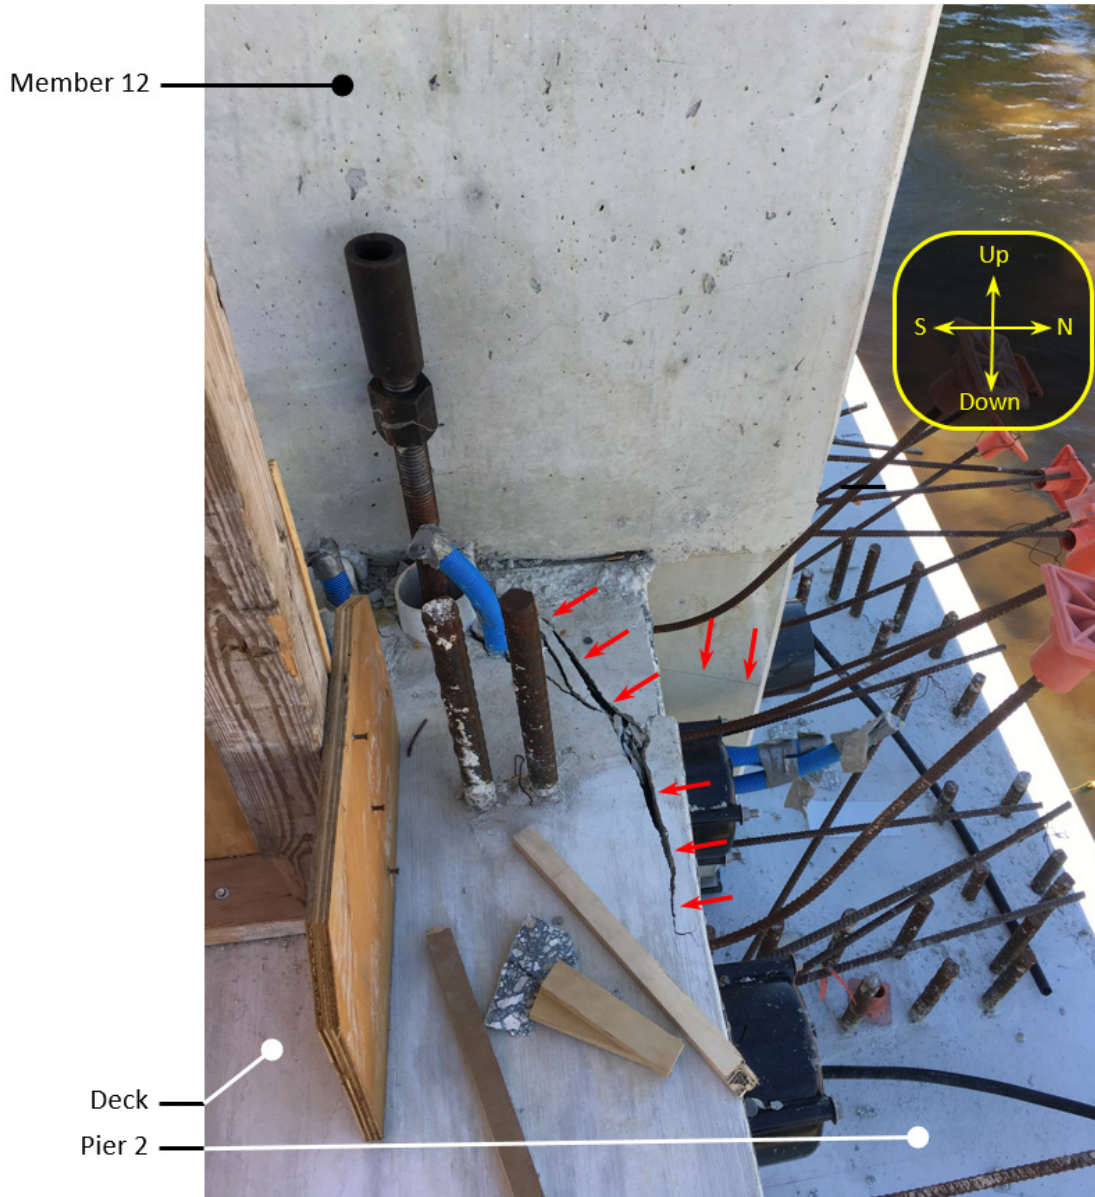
Photograph showing the east face of truss member 12 where it meets the deck on March 14, 2018 at 1:50 p.m. Corresponds to Bridge Factors Factual Report Photo 96.
